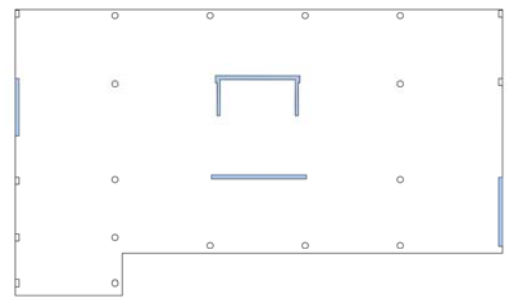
Typical Floor Plan with Lateral Elements Highlighted (in blue)
